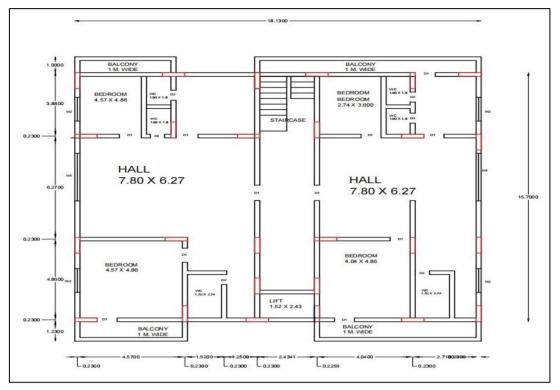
Typical Plan of building having conventional sizes of column and beam
